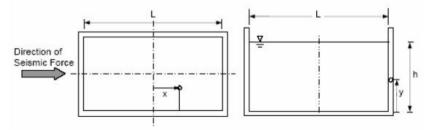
(a) Plan of the rectangular tank; (b) Sectional elevation of the rectangular tank
